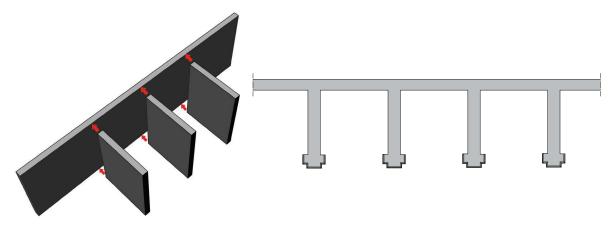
Structural scheme of historical cemeteries built entirely in masonry.
